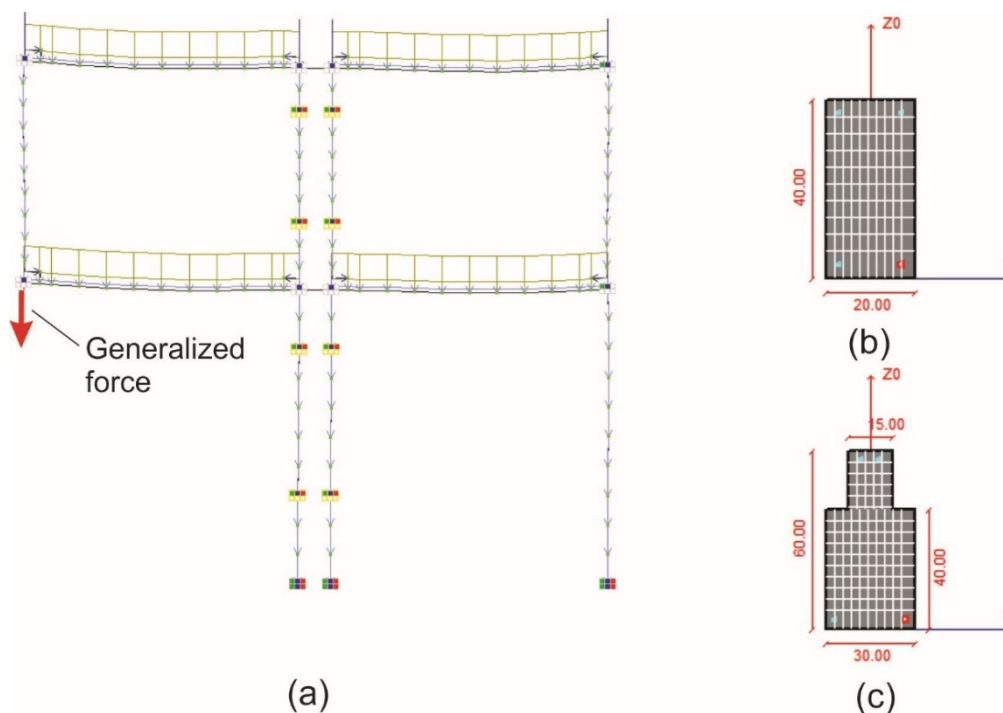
Secondary calculation scheme of second level at the stage of the outer column removal: quasi-static model of substructure in place of local failure (a), calculation cross section of column (b), calculation cross section of girder (c).
